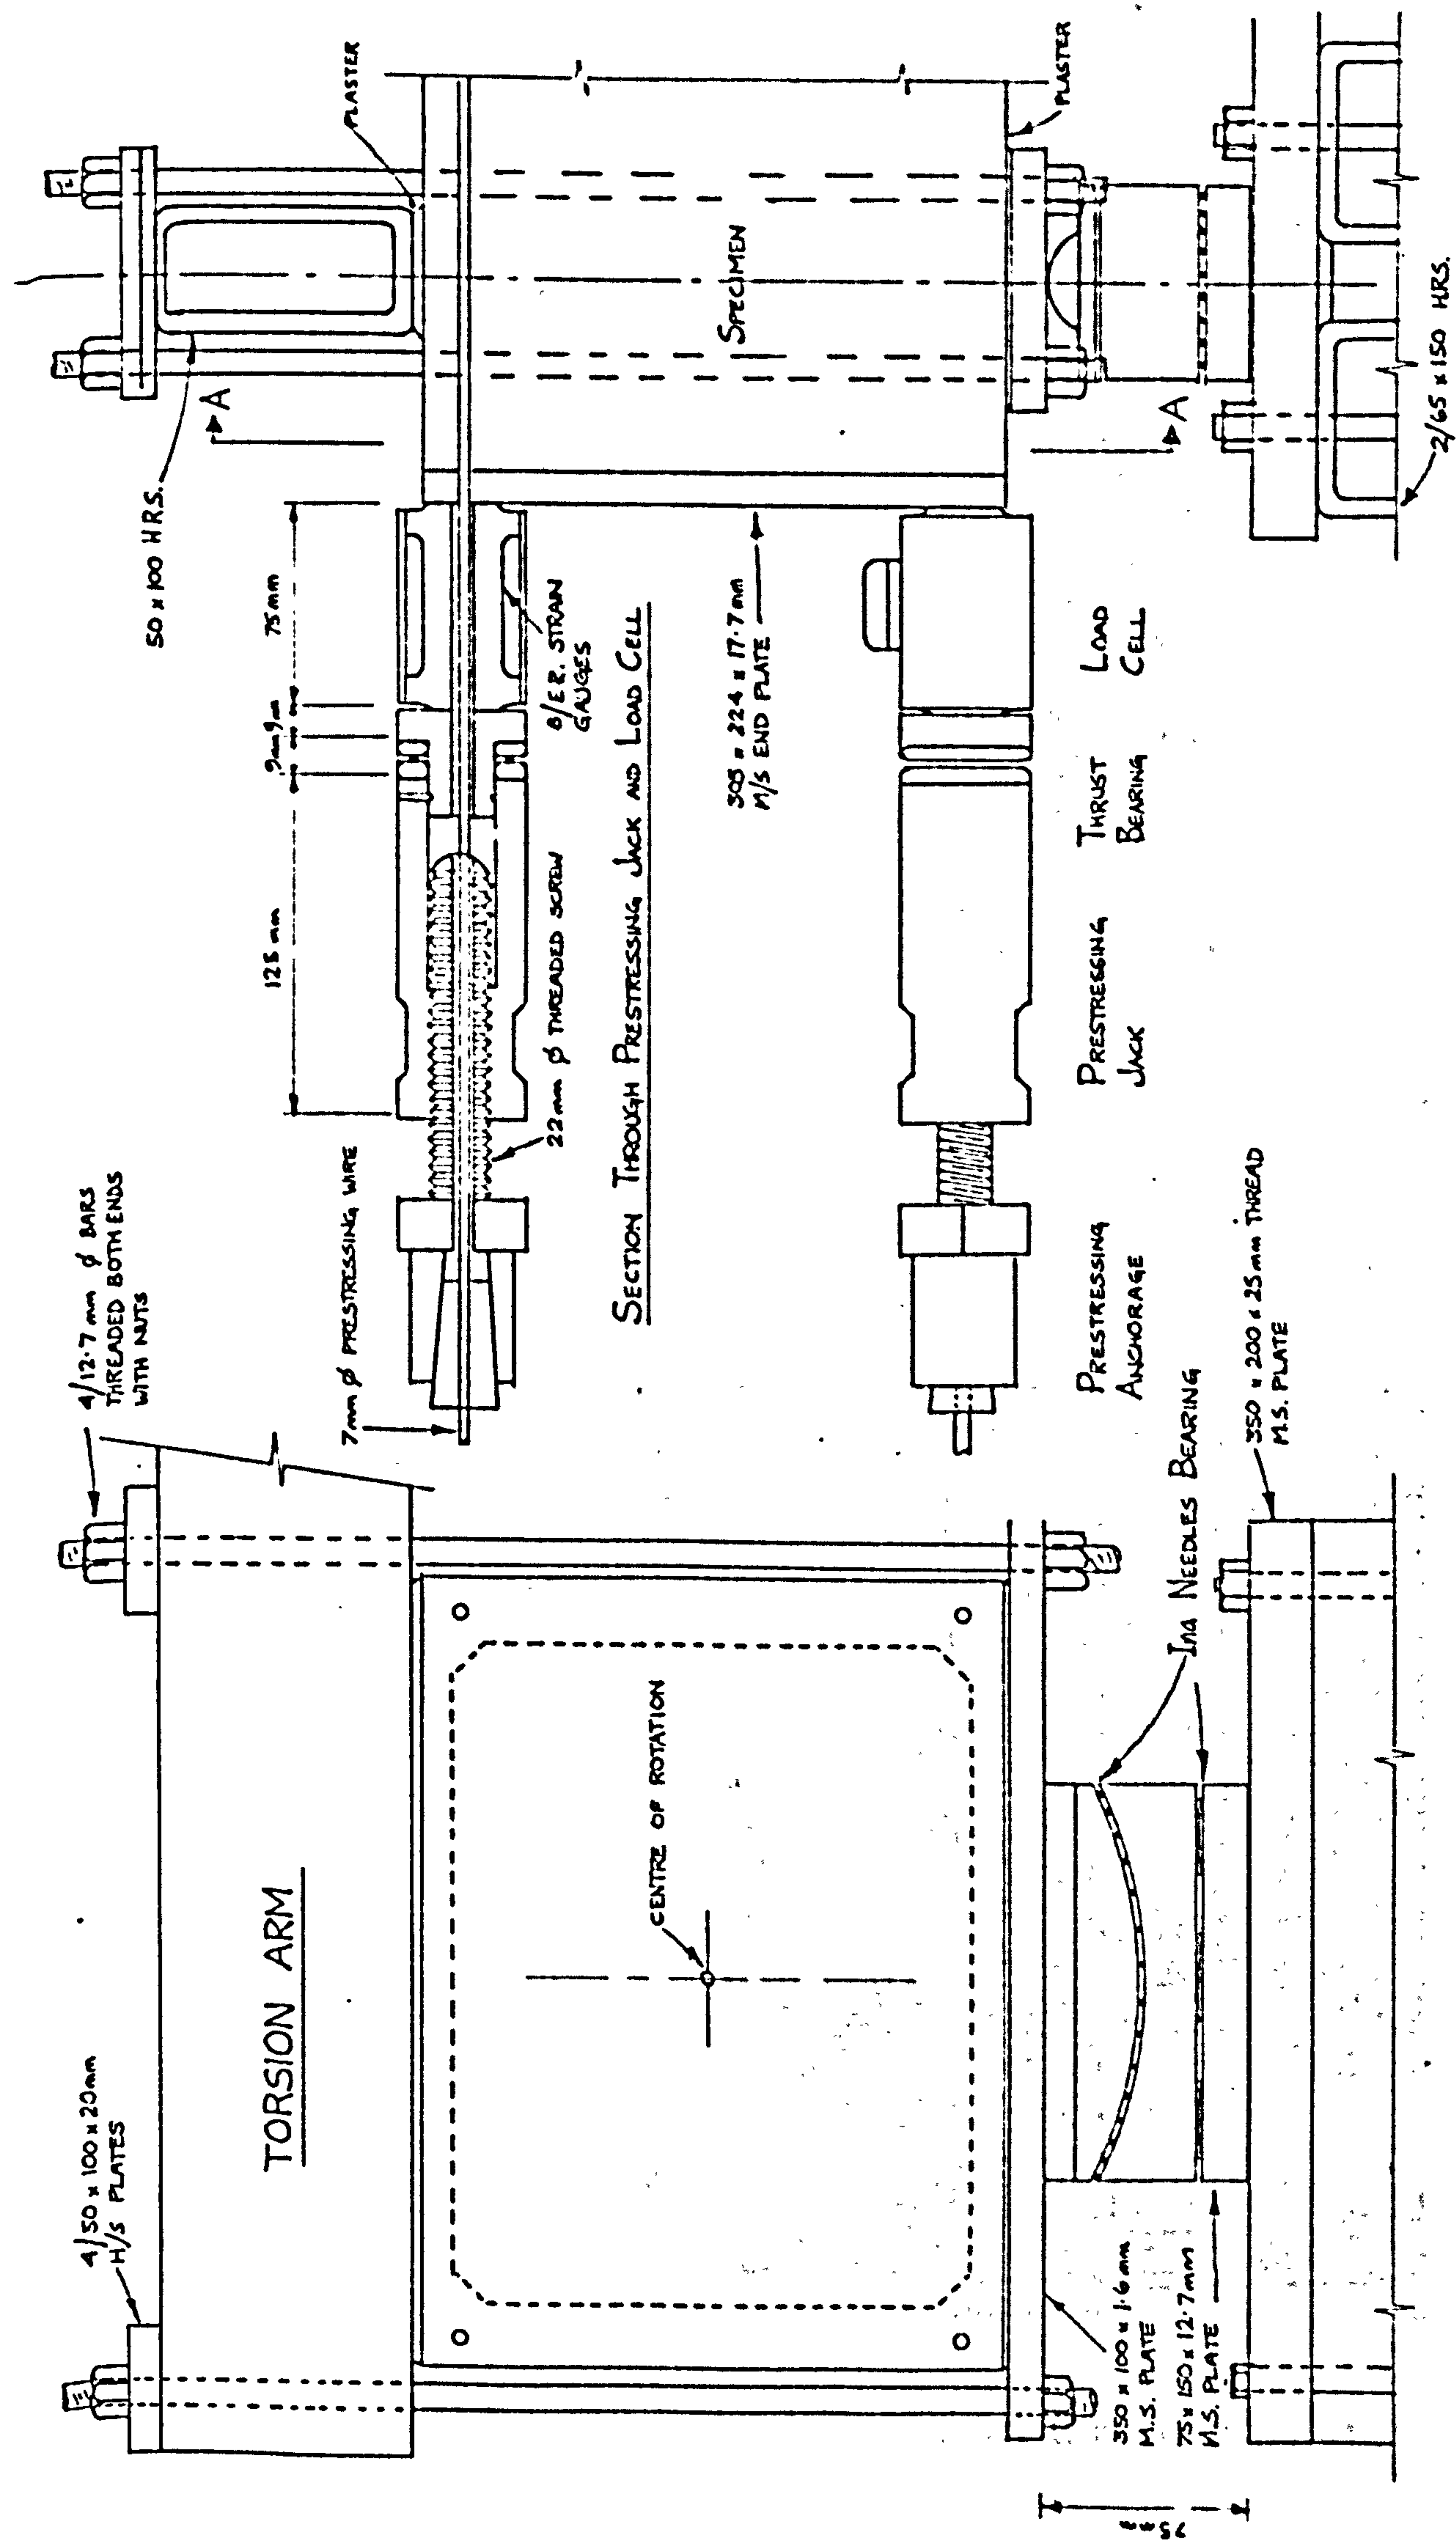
SUPPORT AND PRESTRESSING ARRANGEMENT
